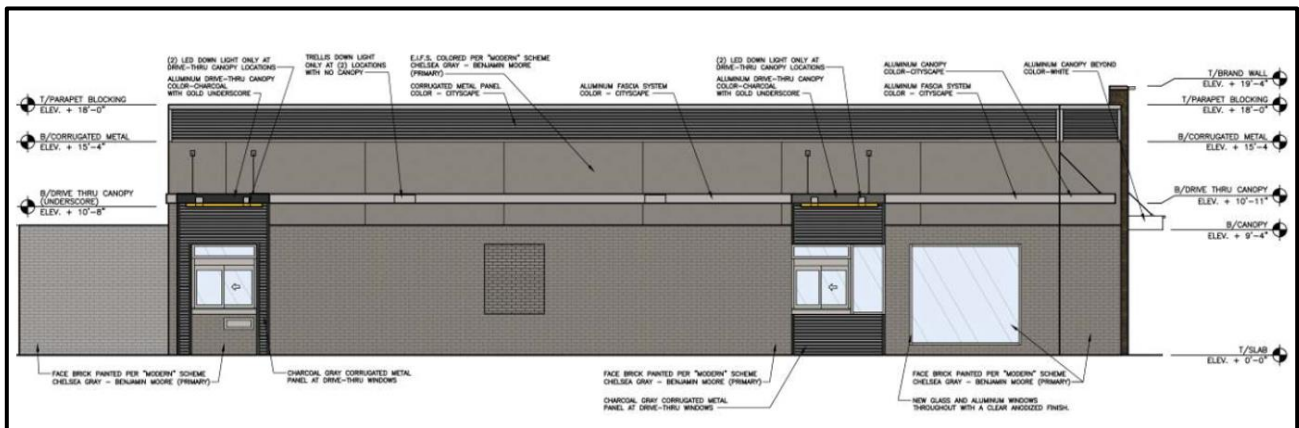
South Elevation seen by vehicles traveling north on Clarkson Road.
